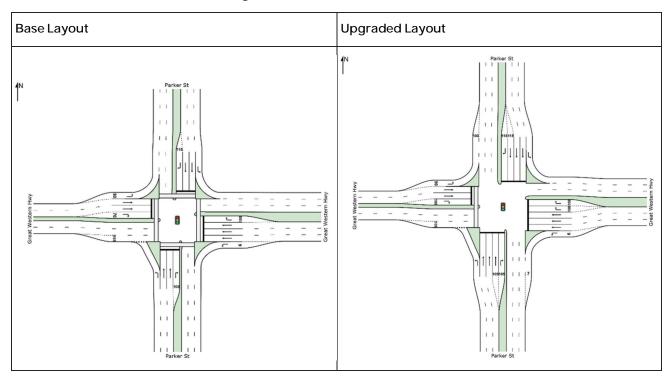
2031 with Links Road extension - Great Western Highway/Parker Street
